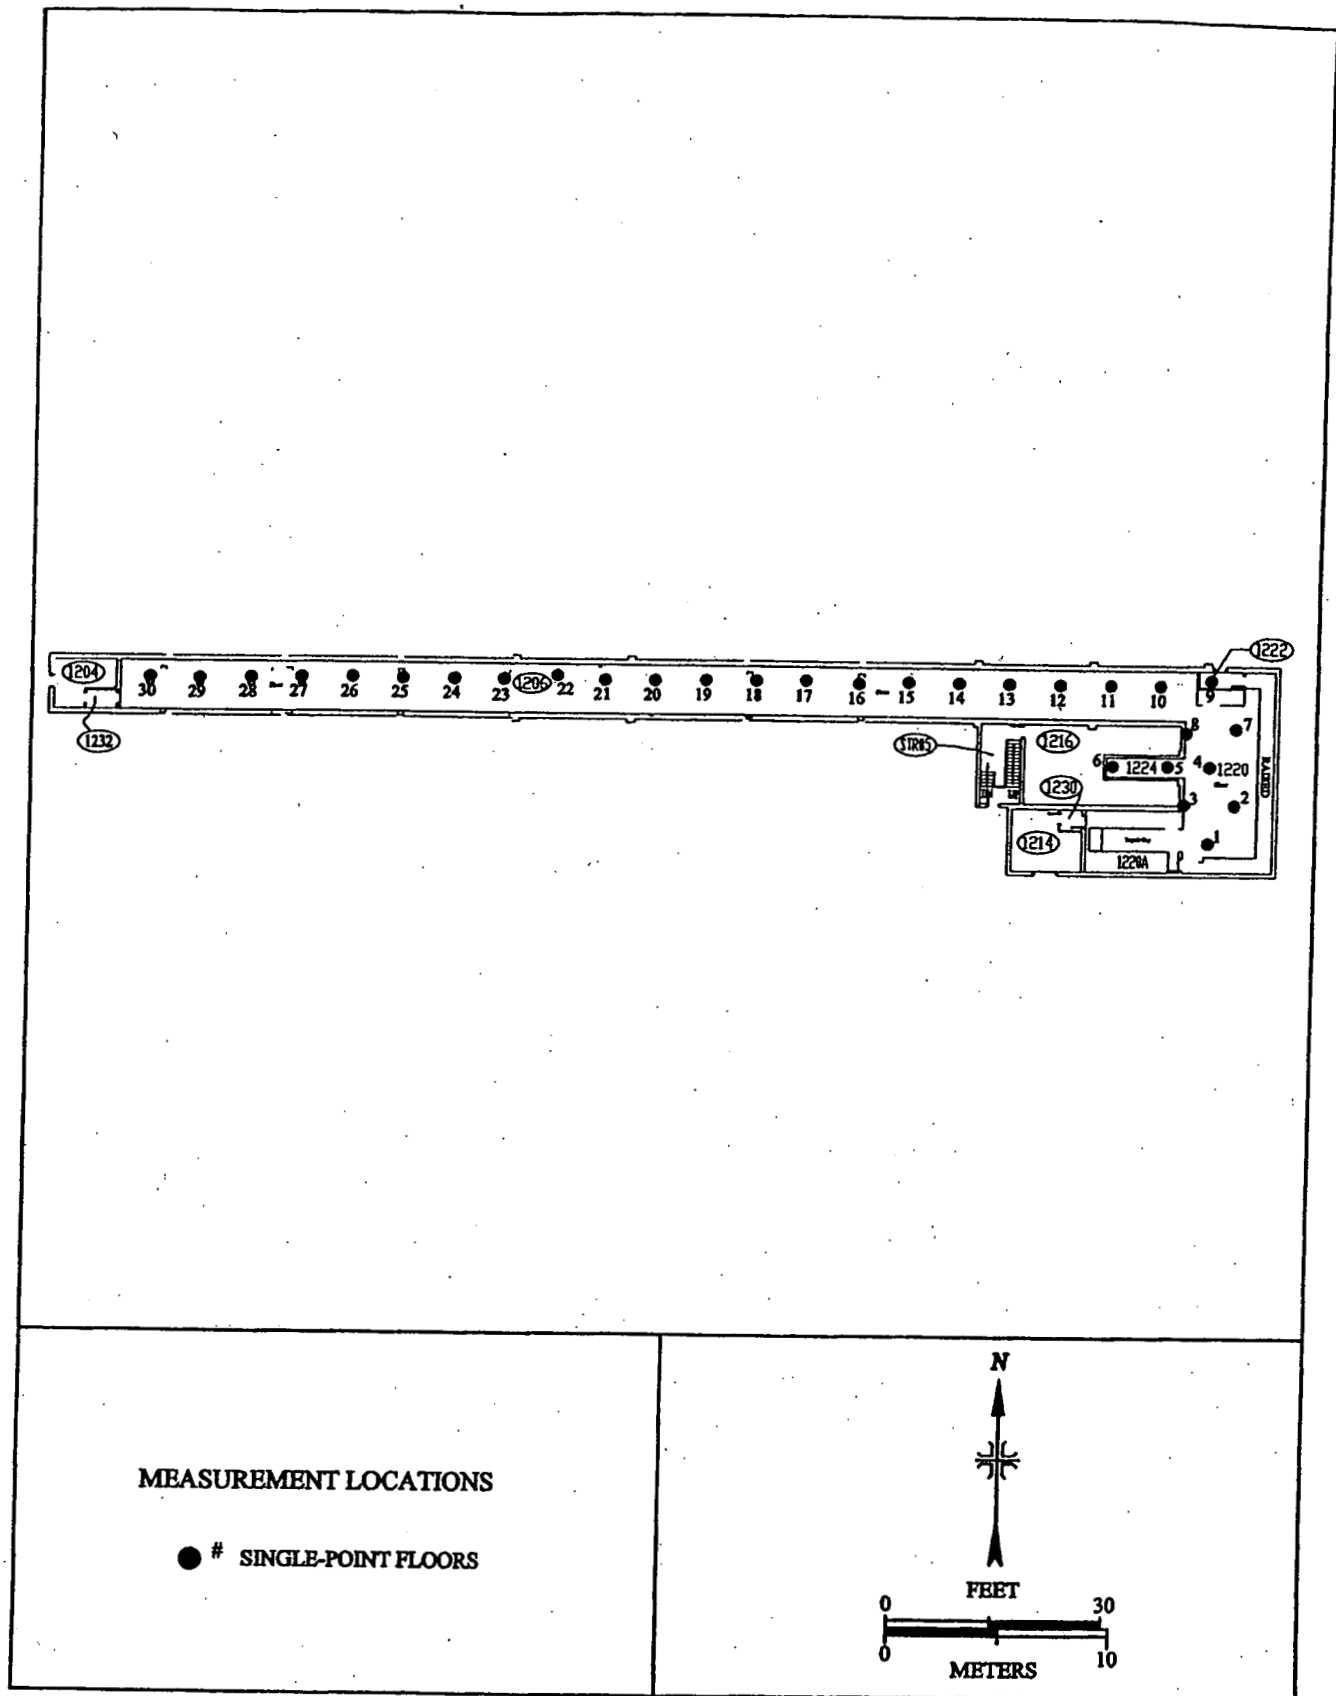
Building 371, Survey Area E - Measurement Locations
